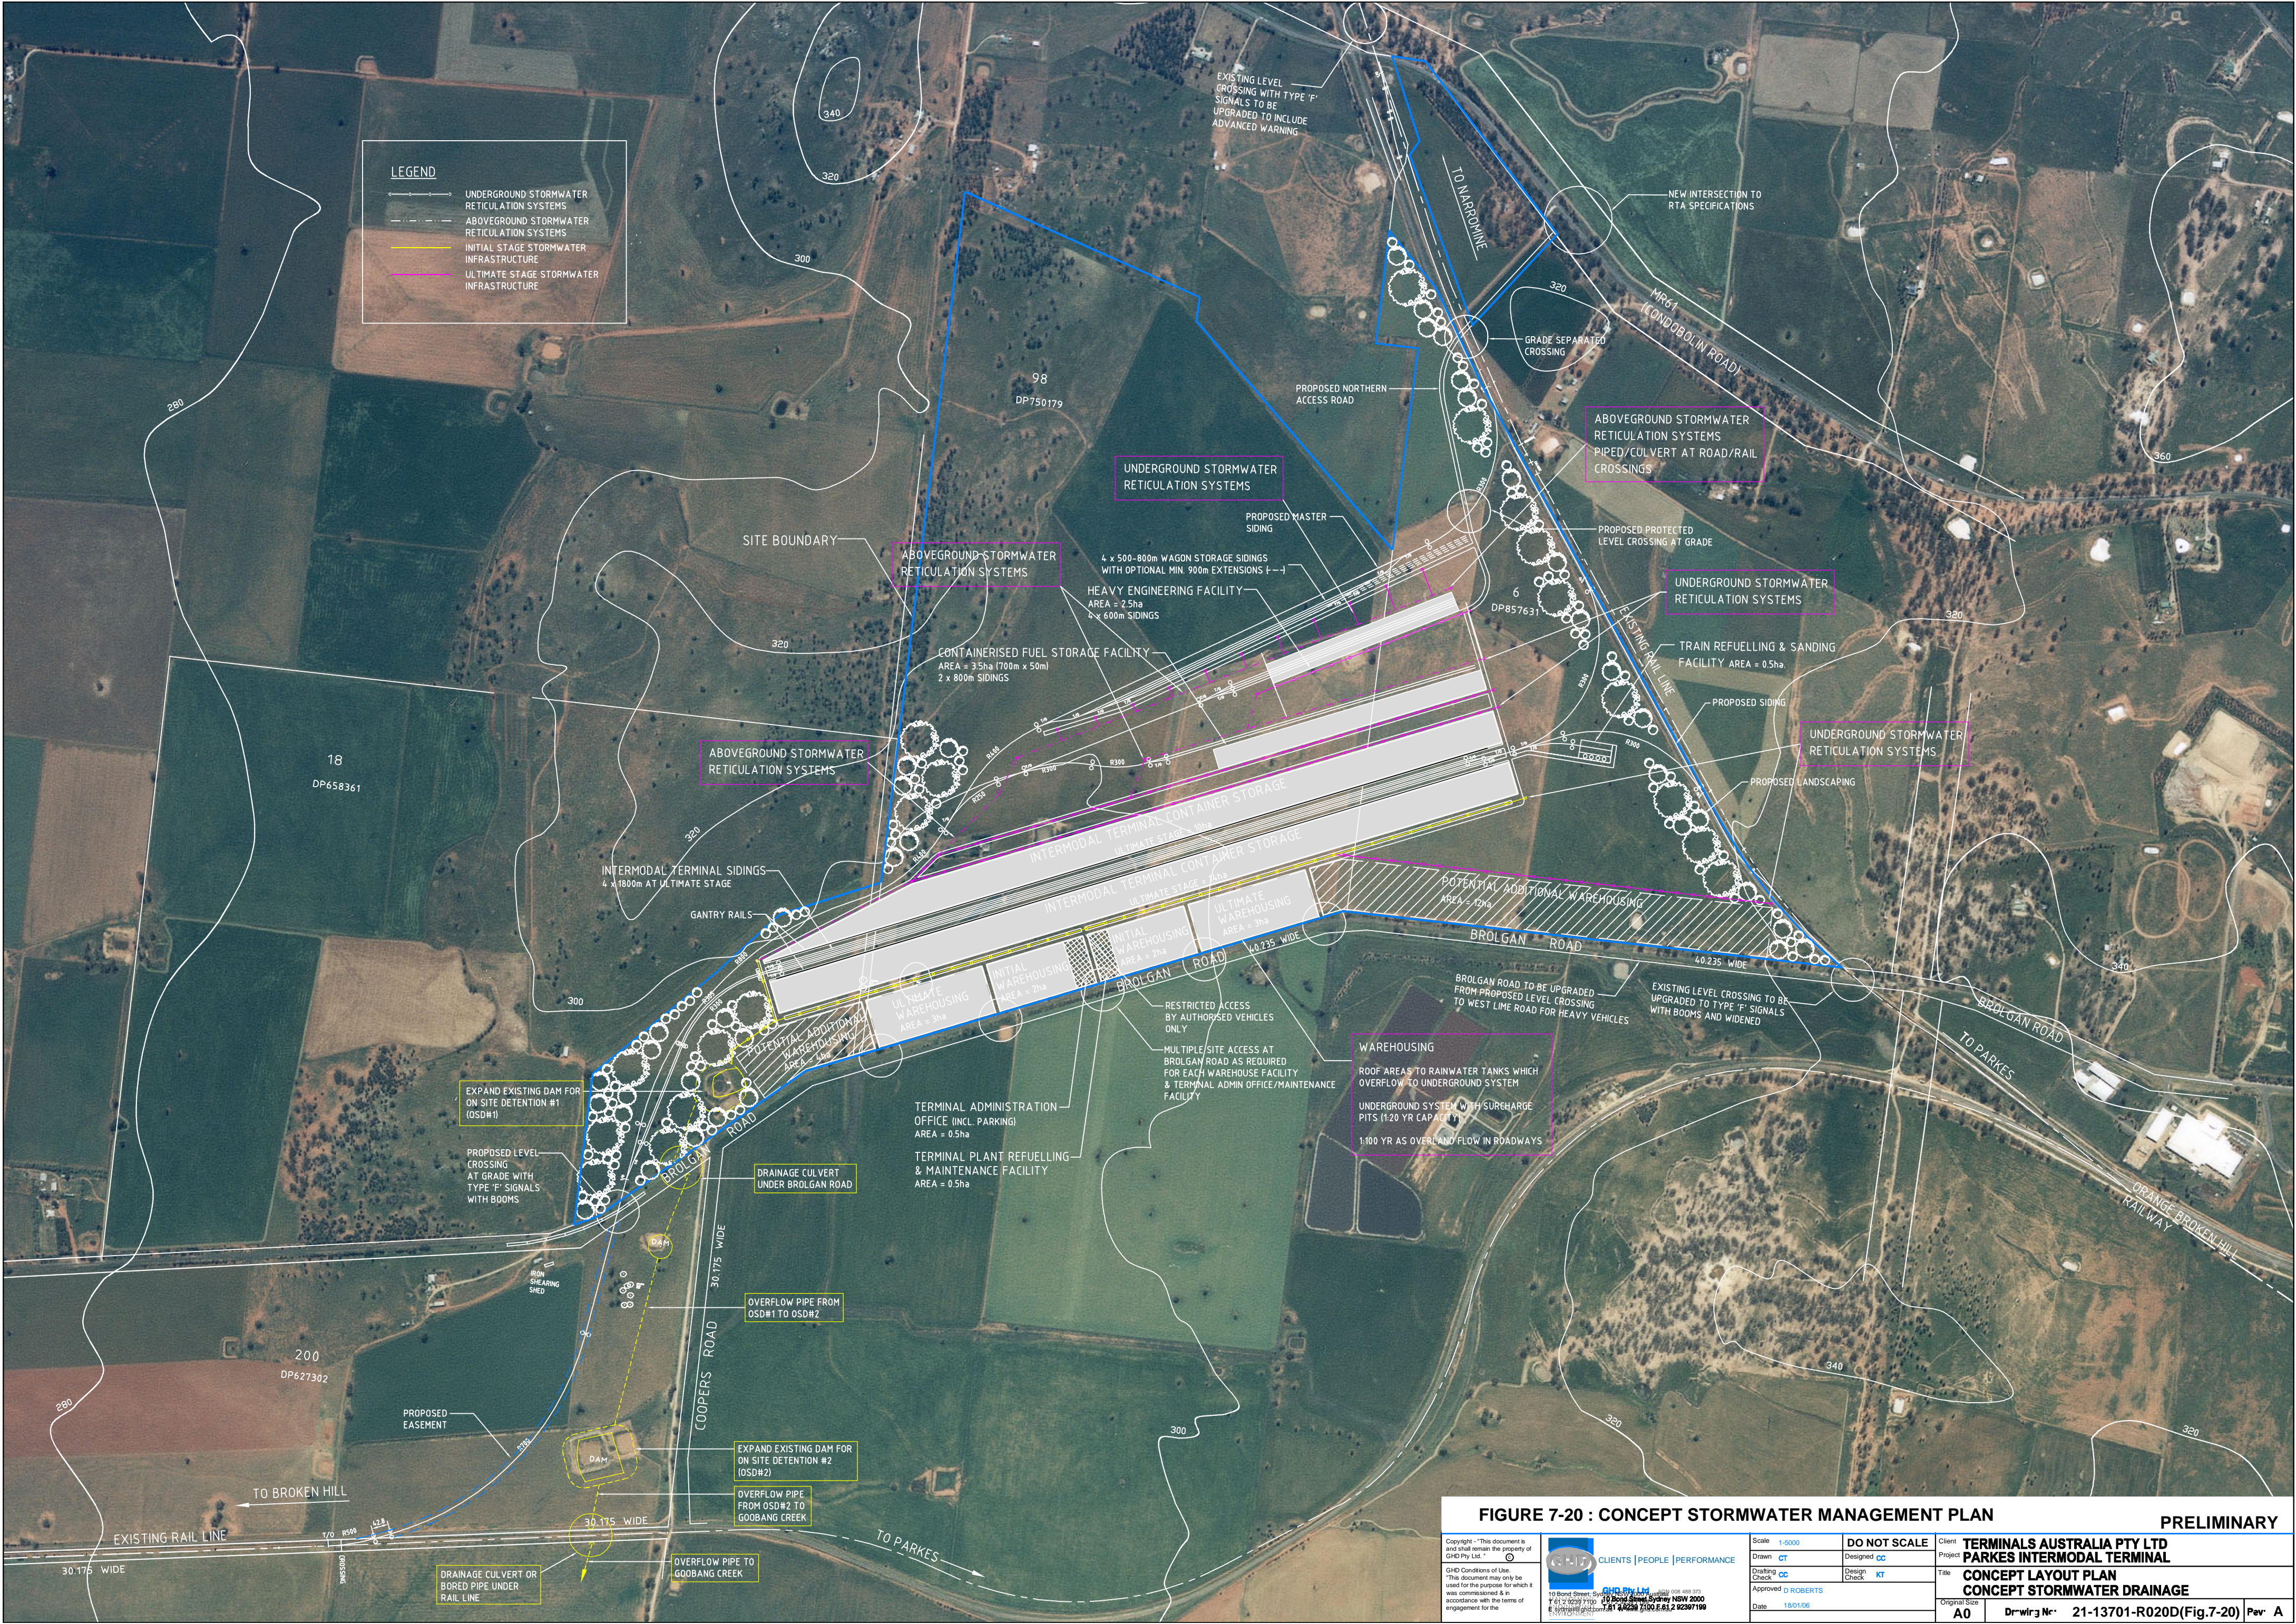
CONCEPT STORMWATER MANAGEMENT PLAN
